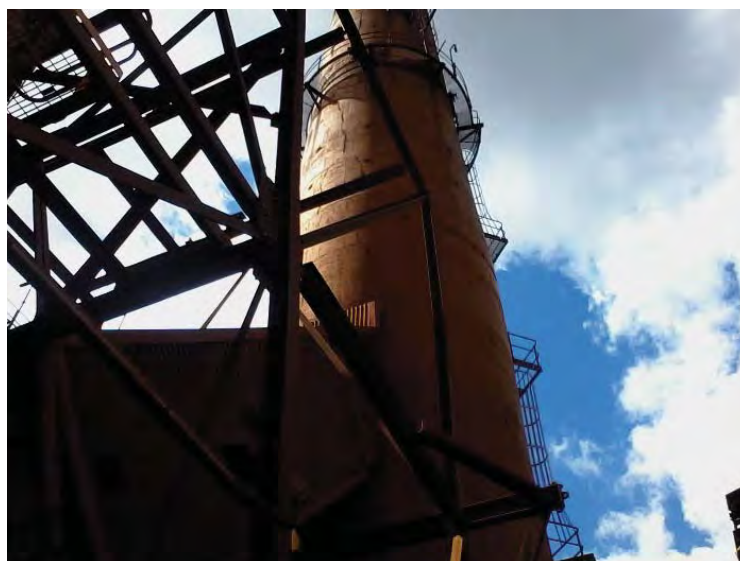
Visible cracks sighted on outer concrete shell of the 320 Exhaust Stack
